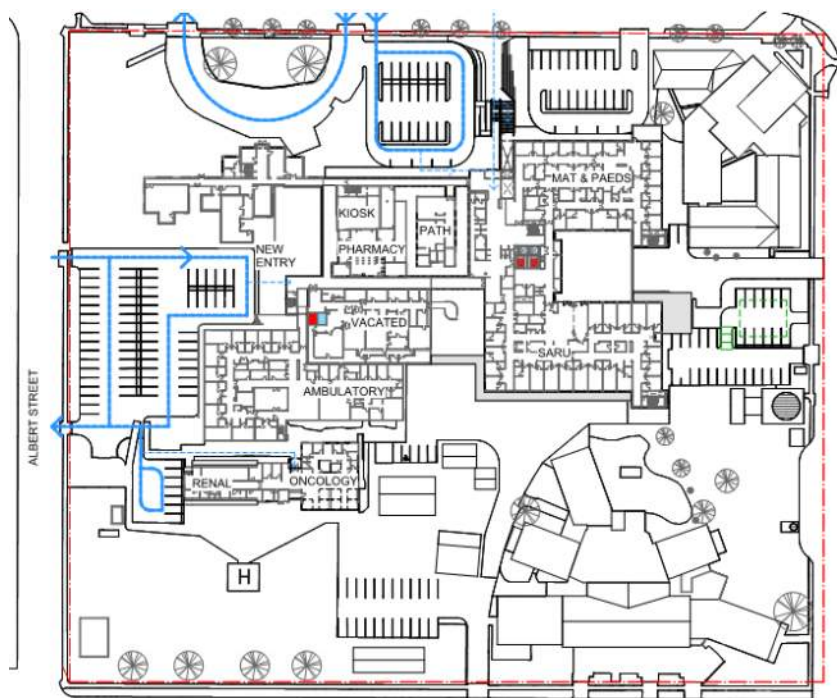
Ground Floor site access & wayfinding diagram (Source: BLP)
